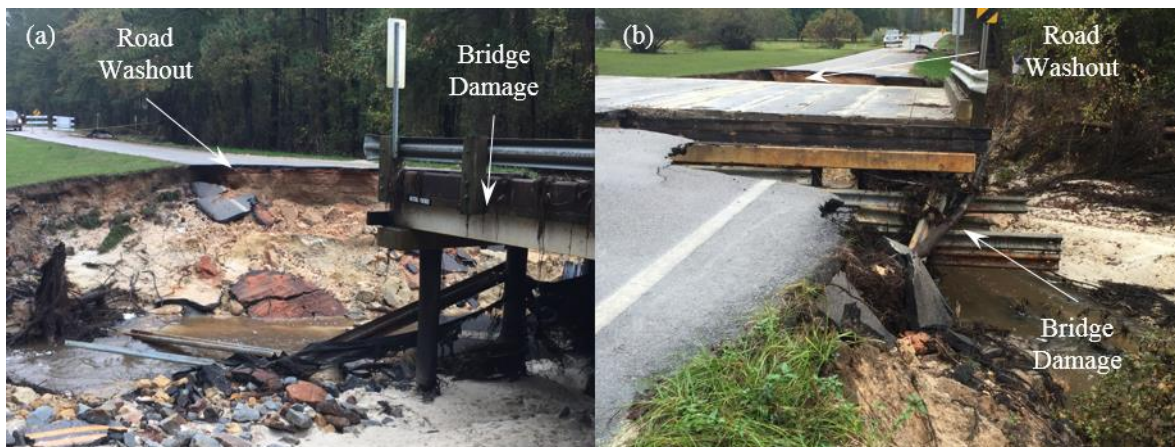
Congress Road and bridge damage: a) northeast view from west shoulder, and b) north view from east shoulder.
